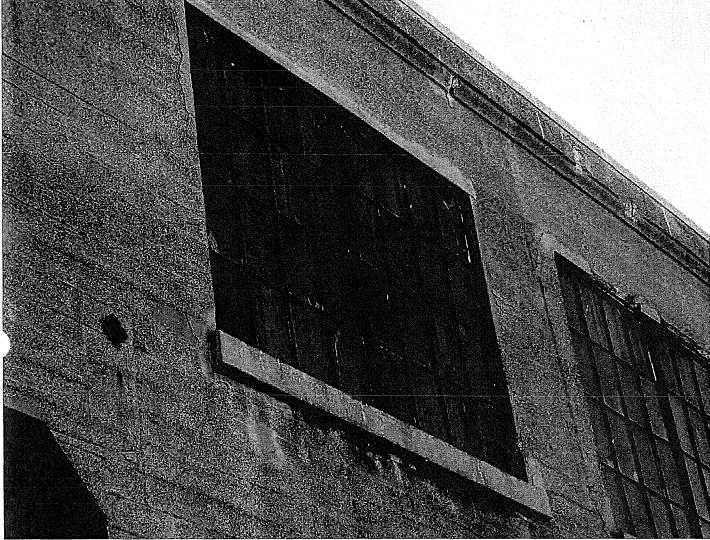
View of the concrete spalling at window openings at east elevation
